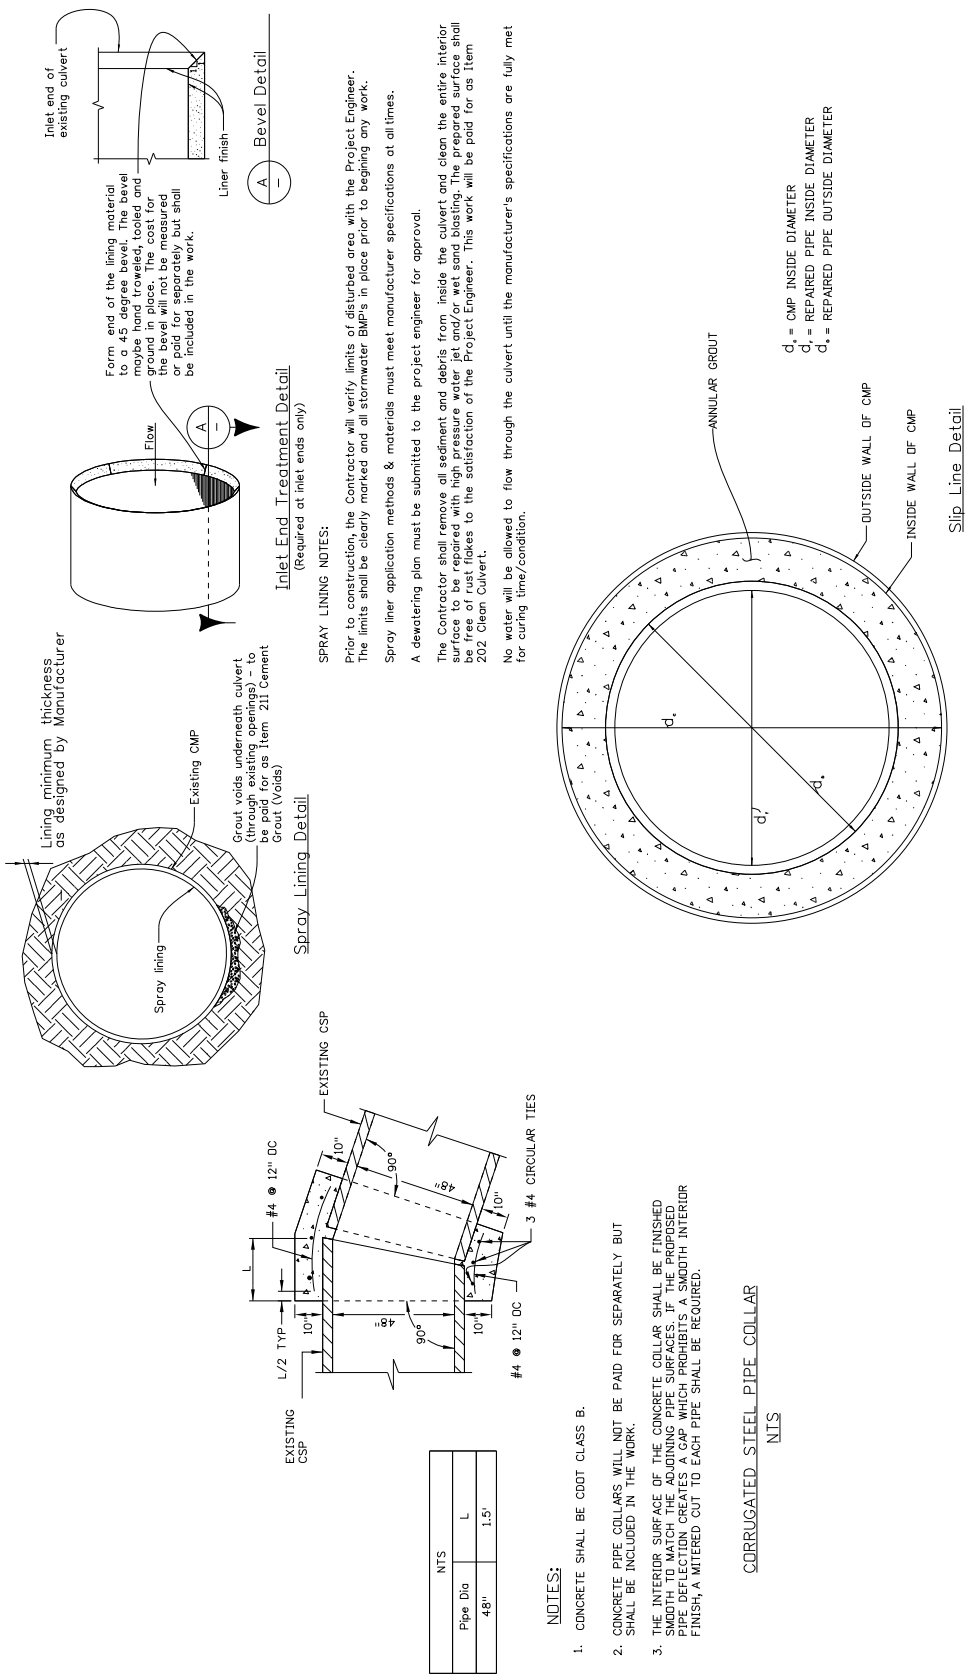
(L)-3 Sample Details for Repairing a circular culvert by slip-lining
